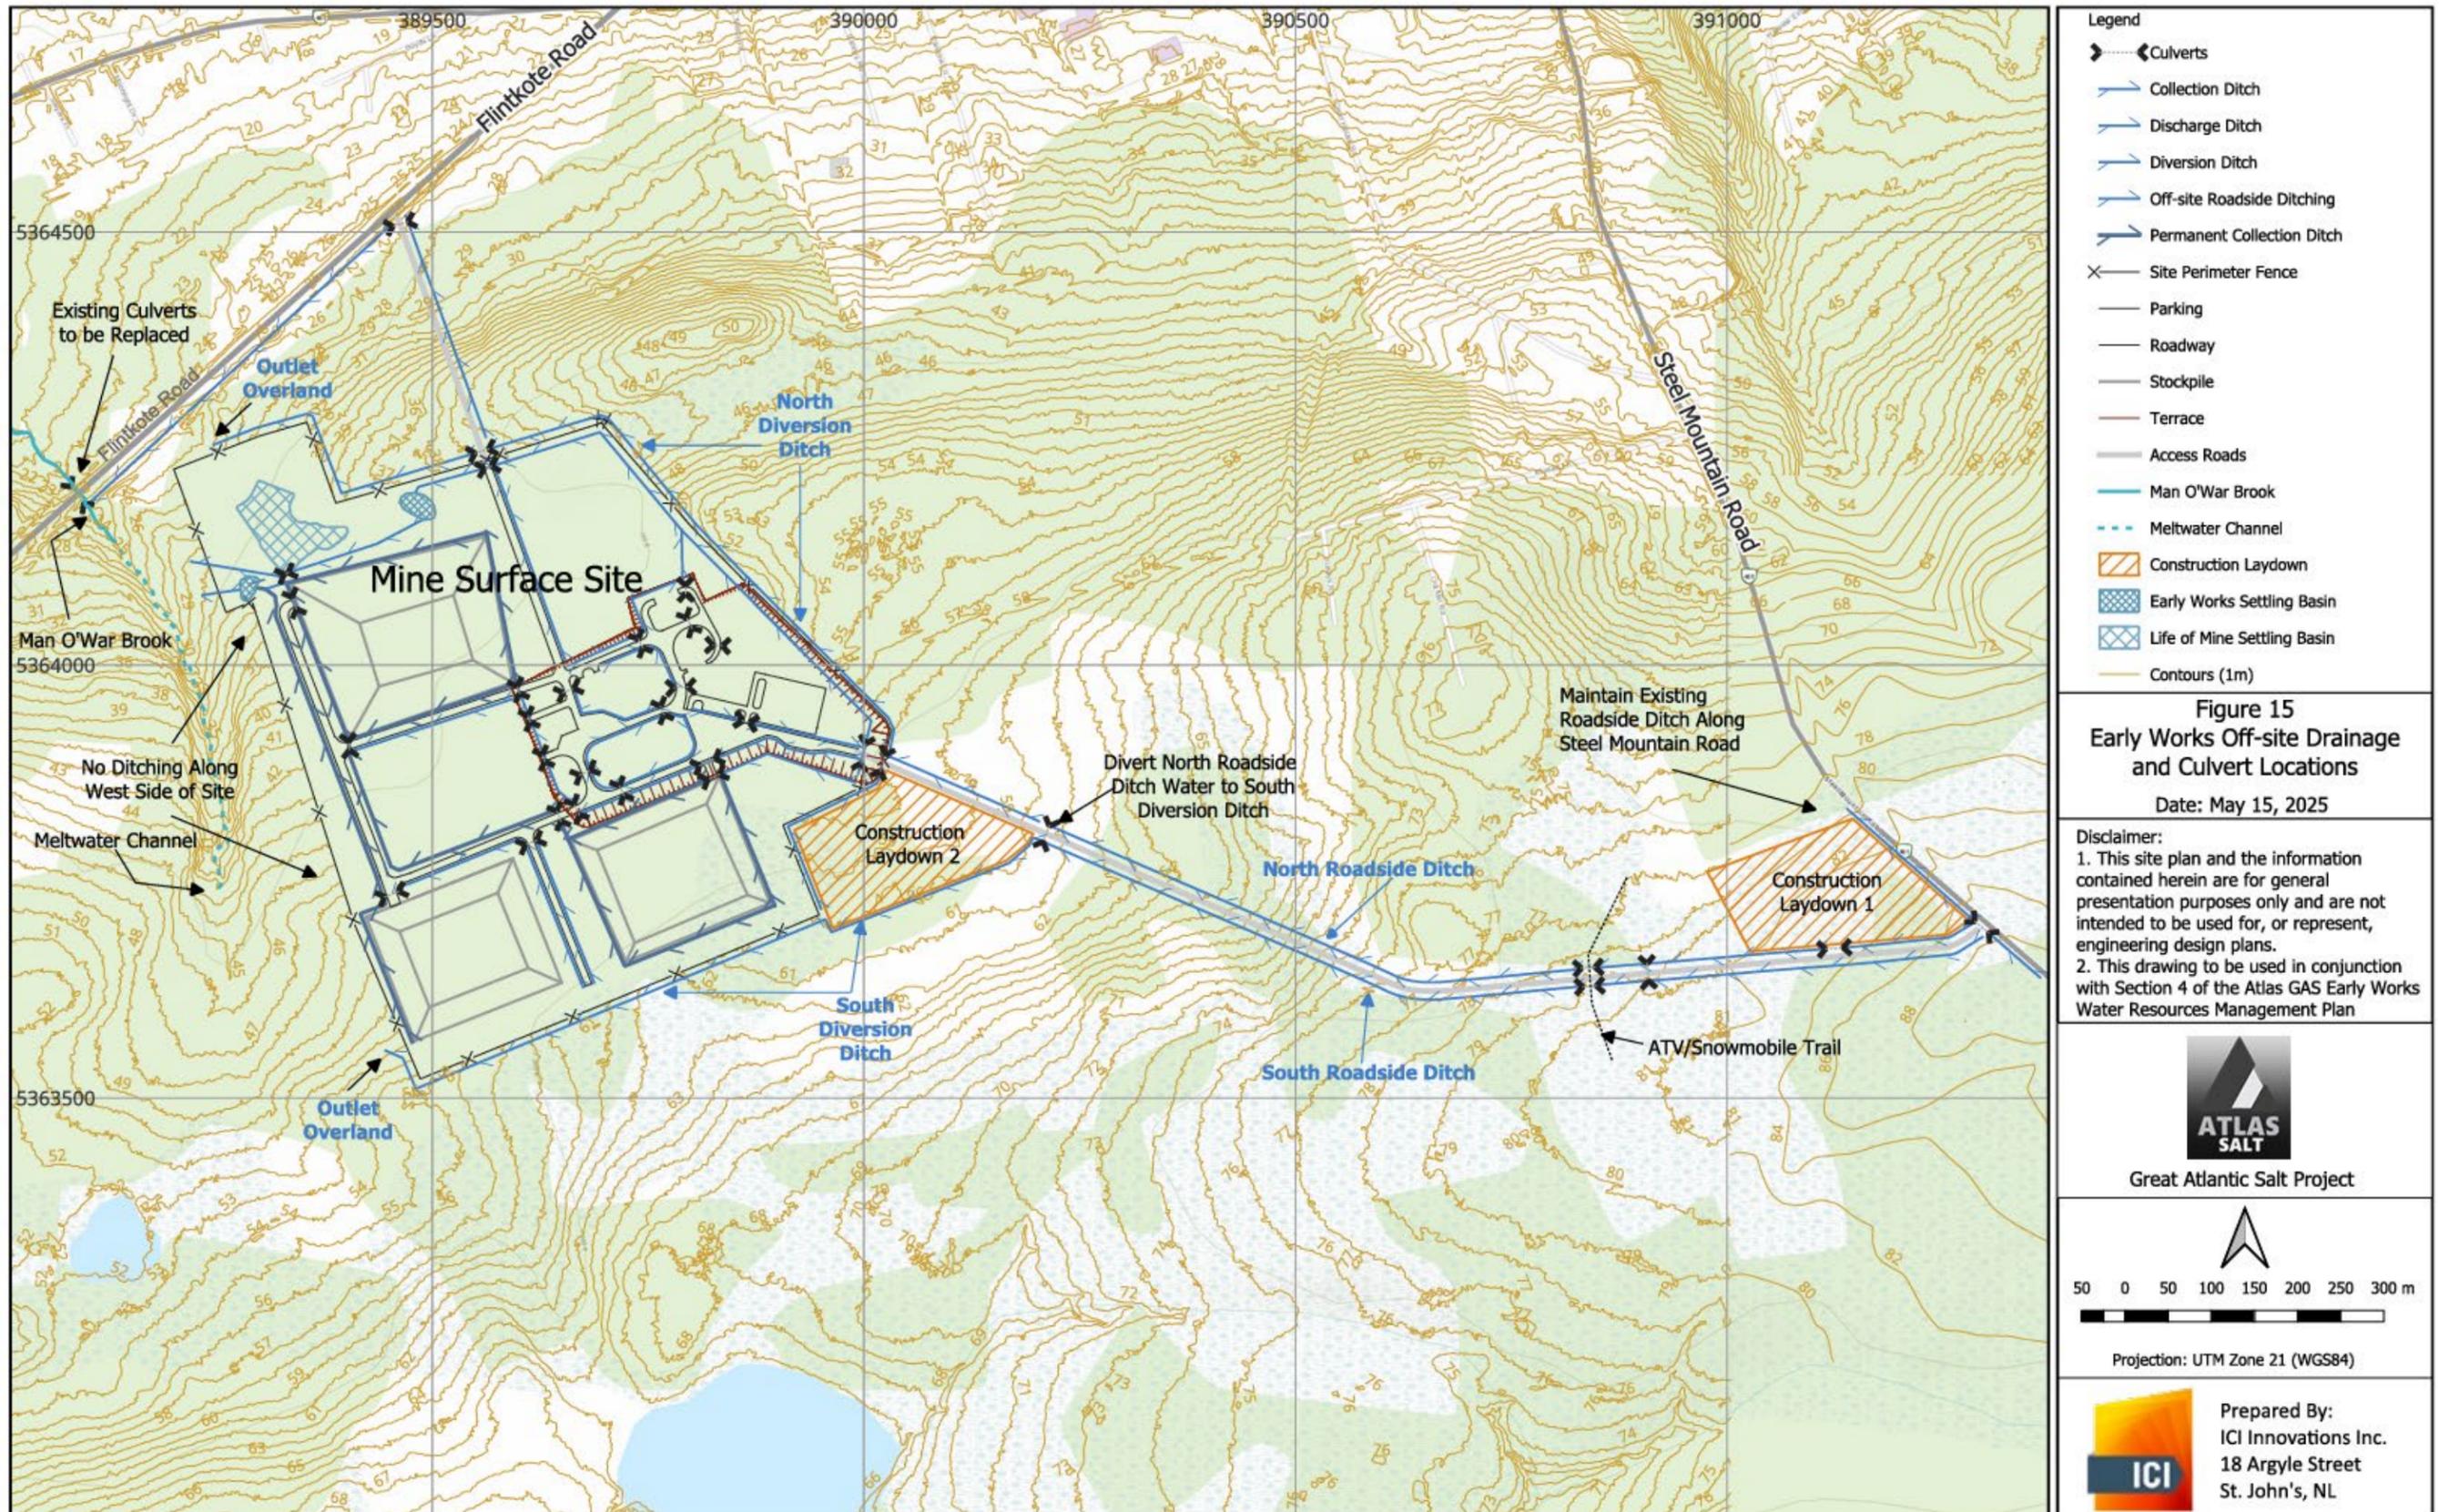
Early Works Offsite Drainage and Culvert Location
